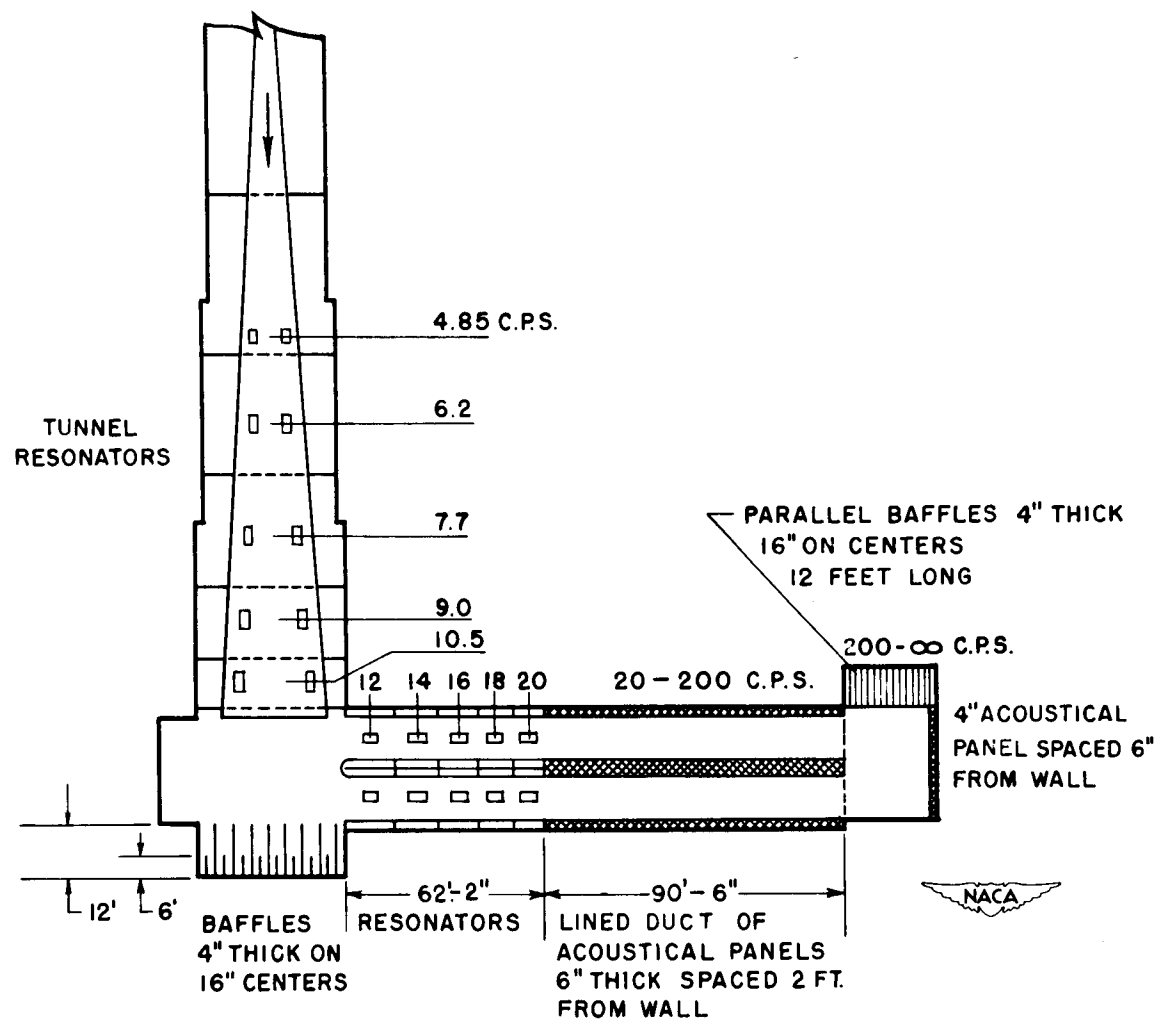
Cross-Section of Wind Tunnel Muffler.
